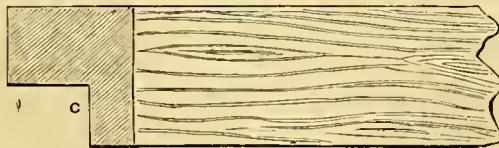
SECTION OF FRAME SHOWING REBATE AT C.
